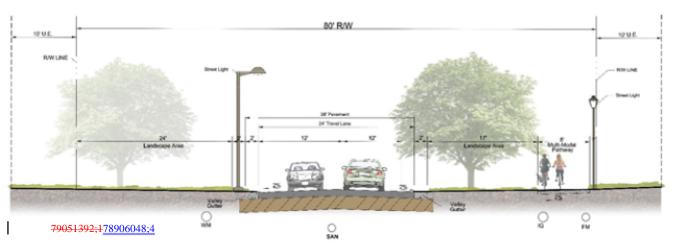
Collector Street Section: 80' Right-of-Way Typical
